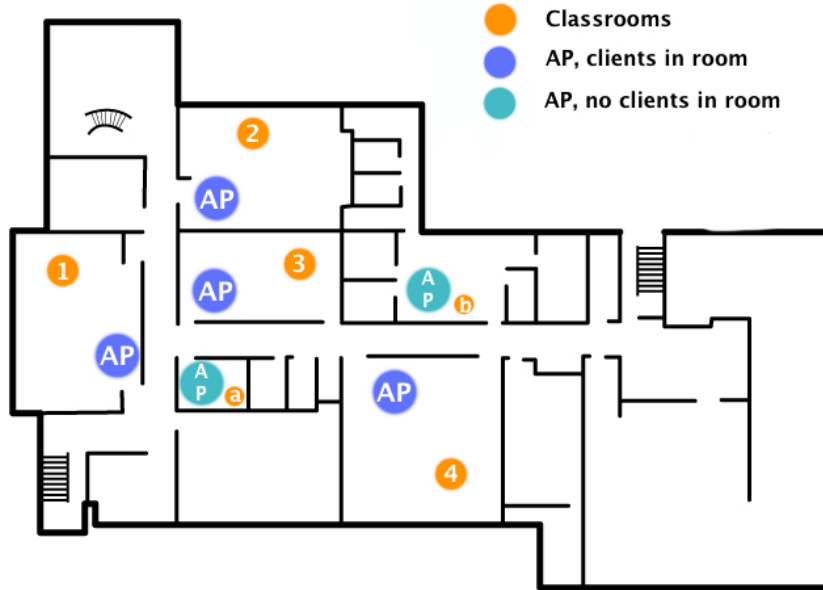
Floor plan of Hinds Hall with locations of Test 2 APs
